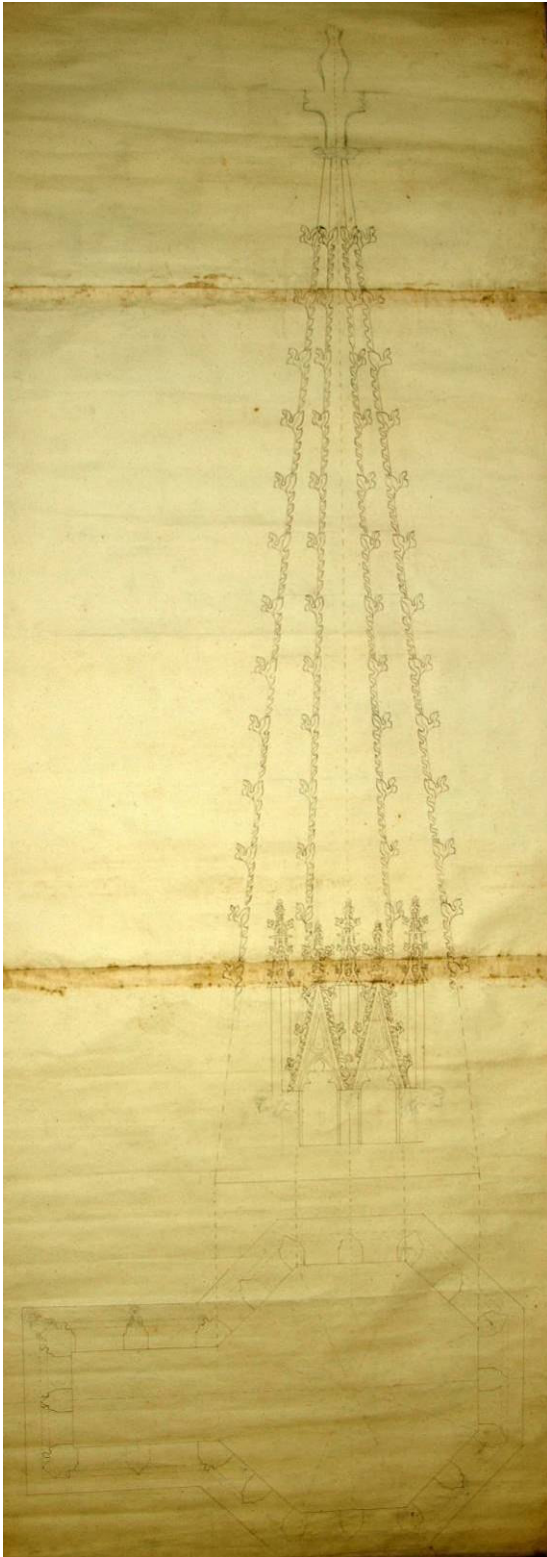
Elevation and section of north buttress and turret with detail, 1840s (YML/3/12)
